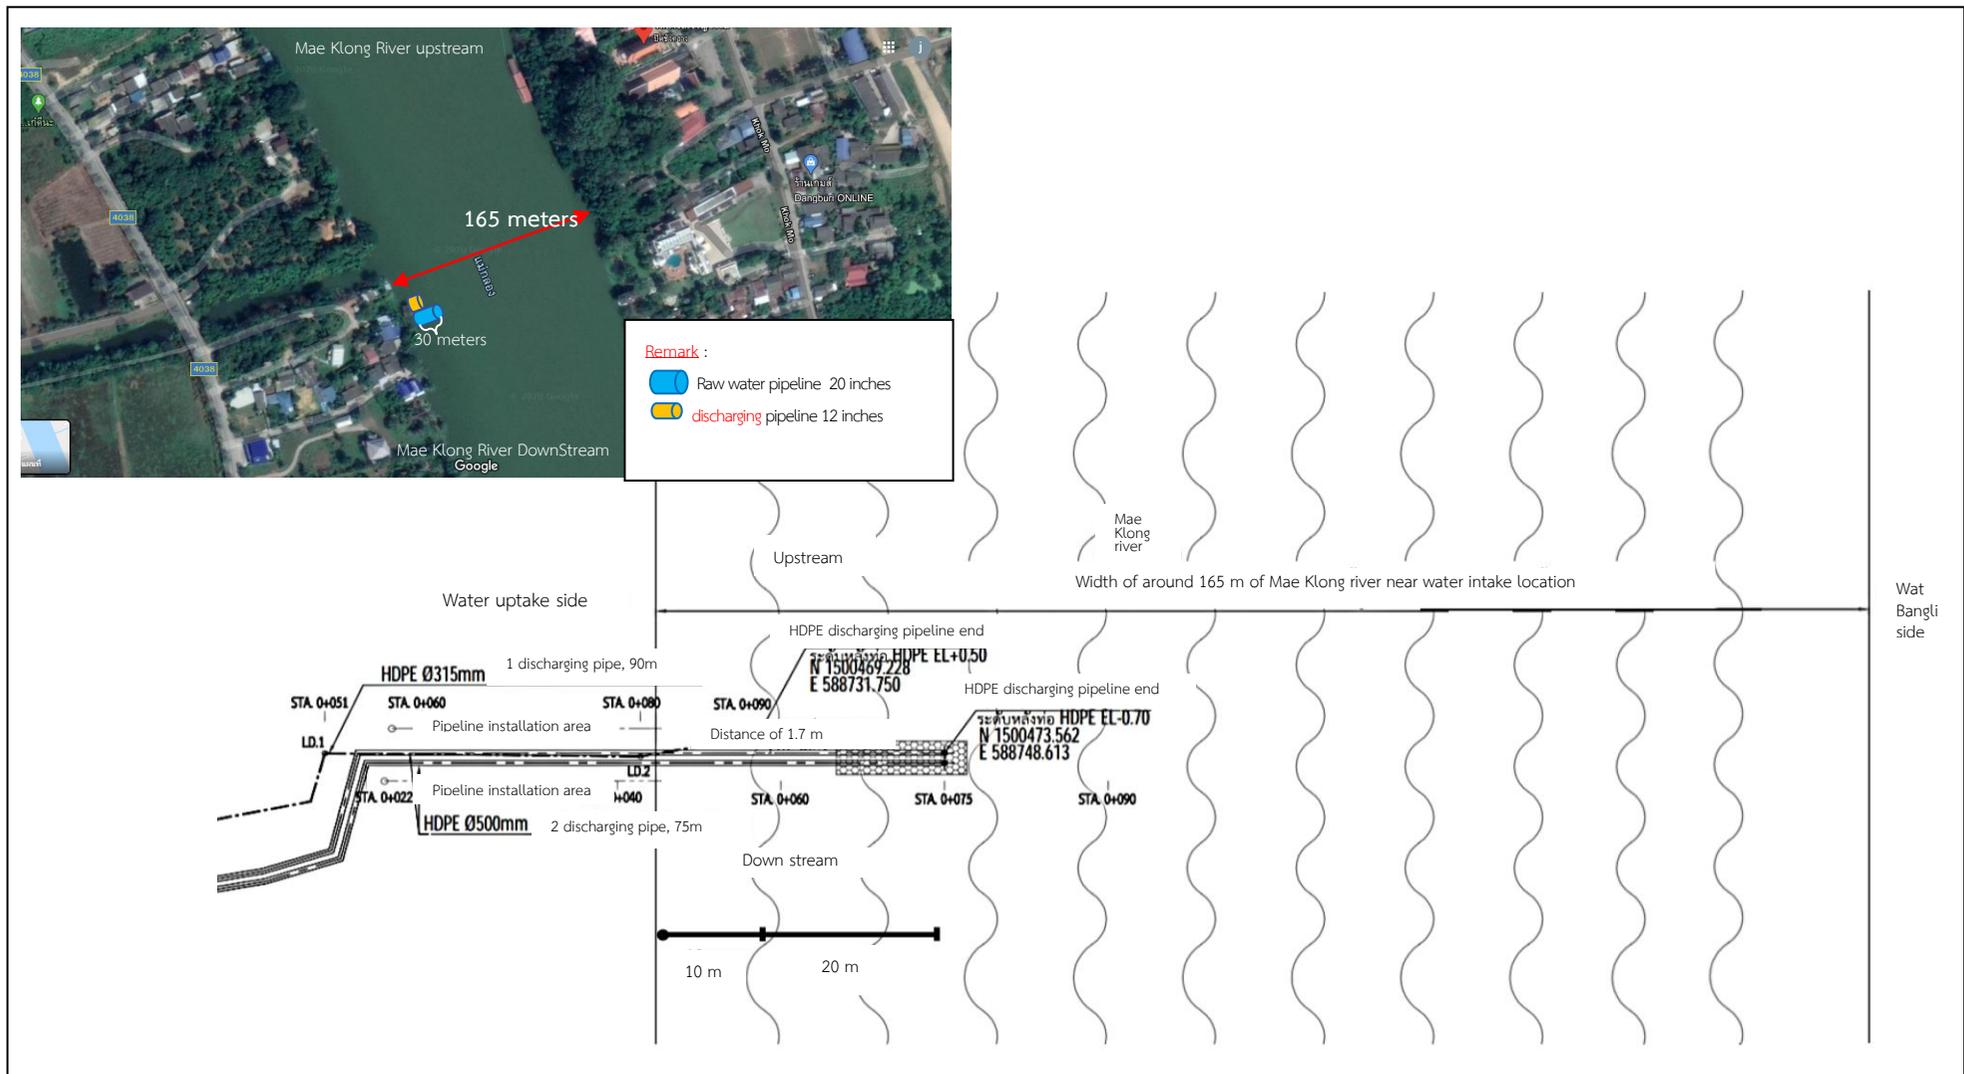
Indicating Raw Water and Waste Water Pipeline near Mae Klong River
